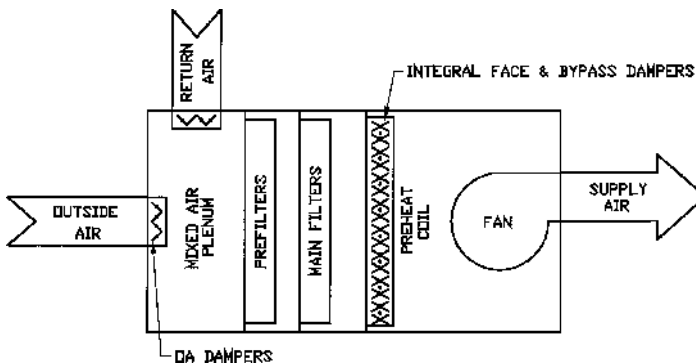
AIR HANDLING UNITS W/INTEGRAL FACE AND BYPASS DAMPERS (PREHEAT COIL FREEZE PROTECTION).
